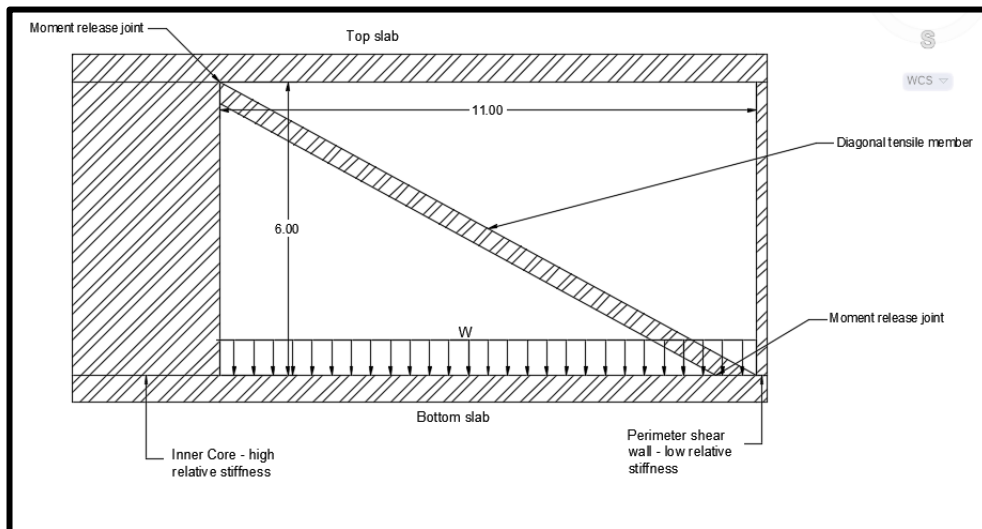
Diagonal Tensile Member Longitudinal Section
